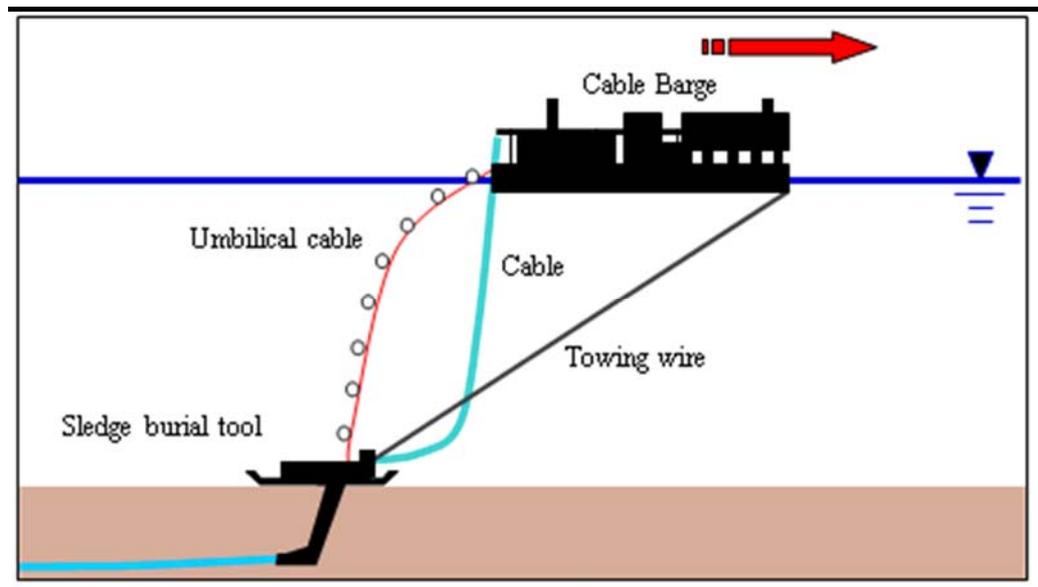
Equipment for Simultaneous Cable Lay and Burial Operation using “Sledge Tool” or “Injector Tool” Typical installation barge
